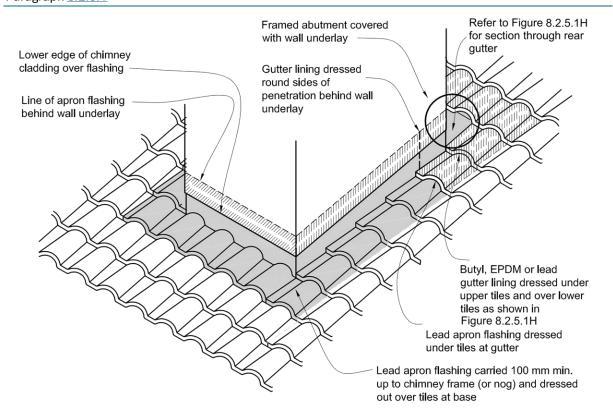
Flashing to framed penetration for masonry tile
